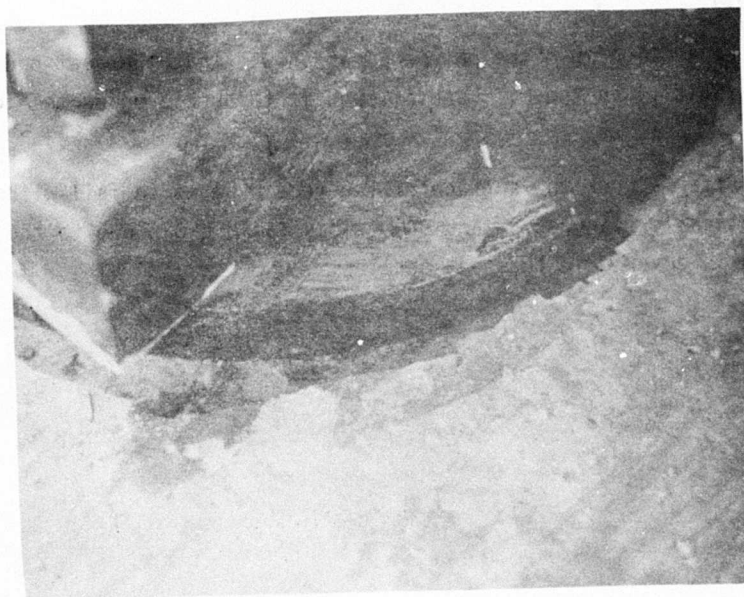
Test 2-1, Punching Failure of Reg-set Cap under Load Plate
